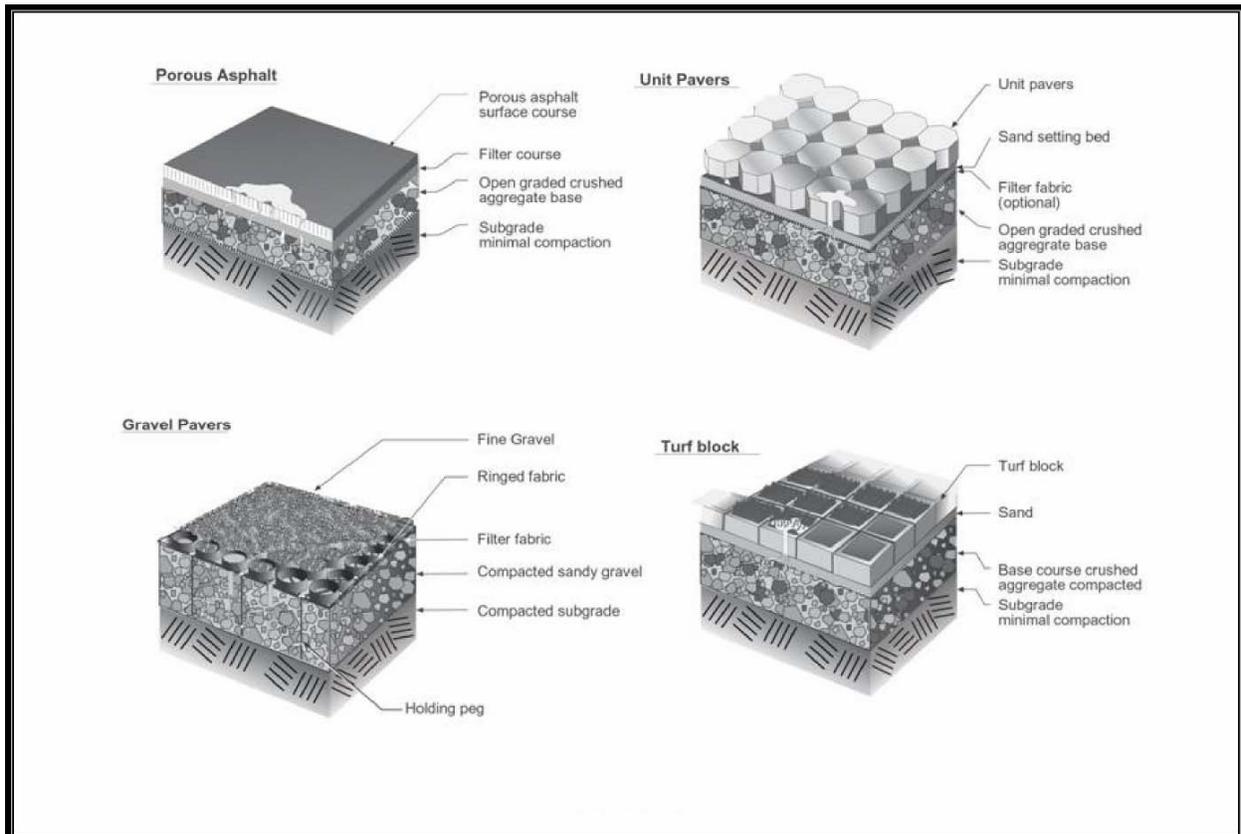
Typical Permeable Pavement Cross-Sections (source: Thurston County)
